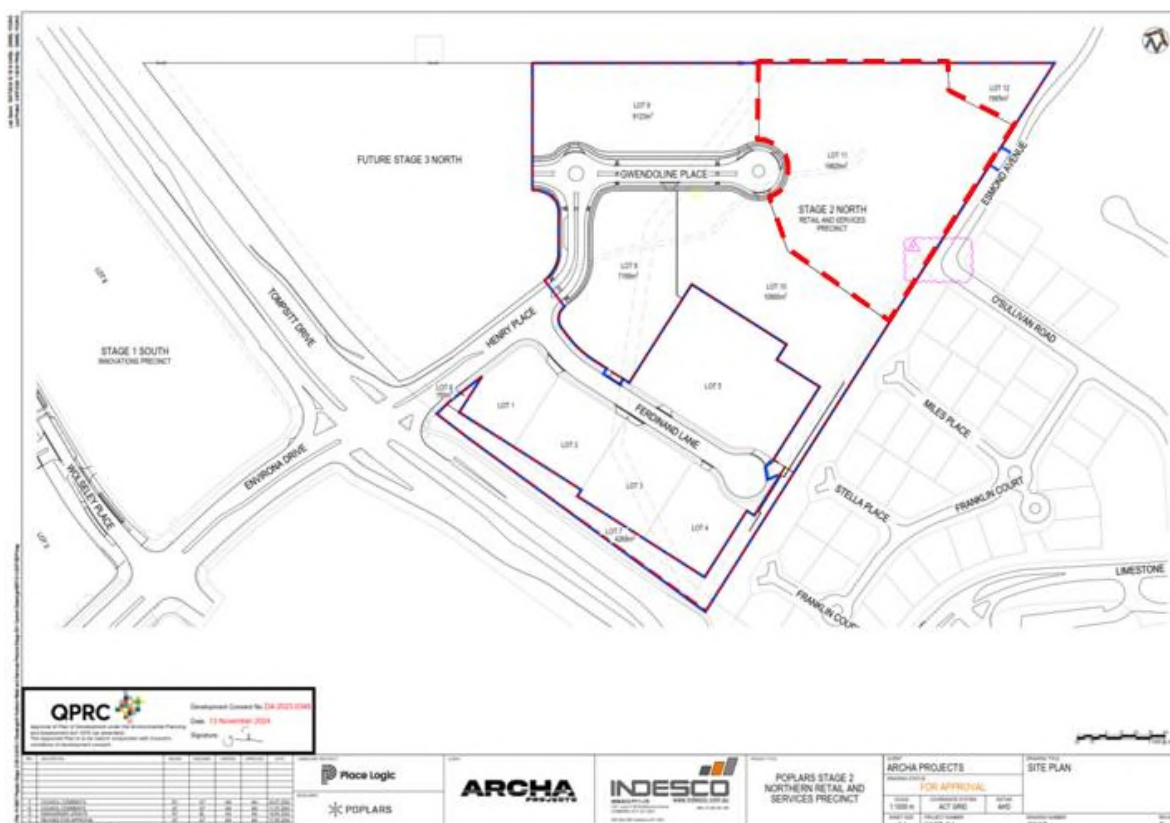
approved subdivision plan DA.2023.0348. Development site outlined in red. Source: Matthew Dean Stevenson.
